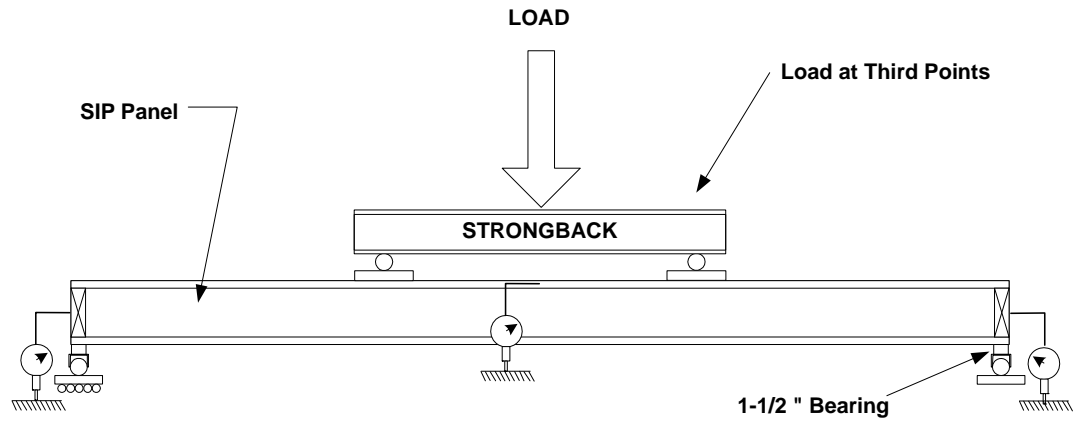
TRANSVERSE LOAD TEST ASSEMBLY
